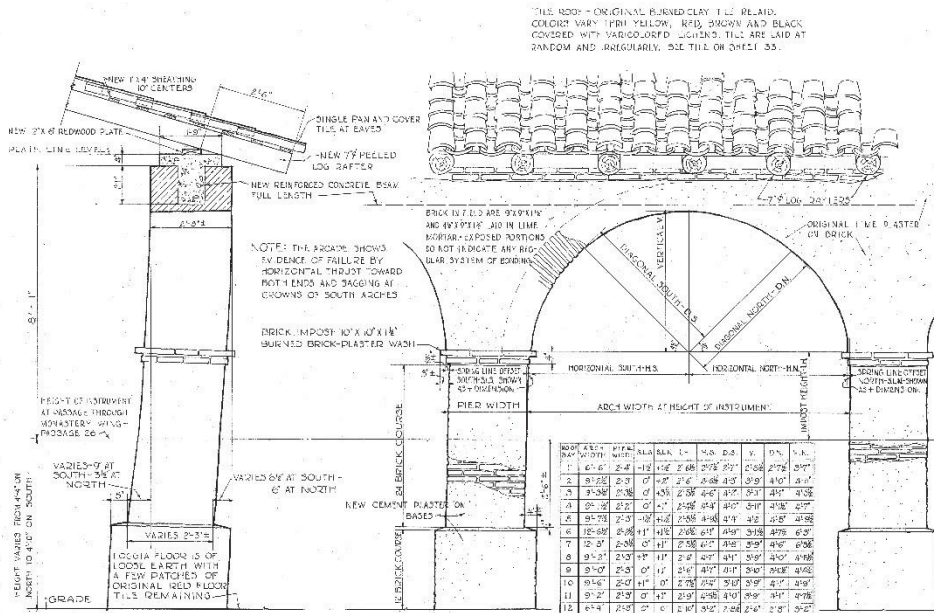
Section Detail Drawing of the Mission of San Fernando (HABS). It is possible to see the reinforced concrete top beam and the indication of the column.
